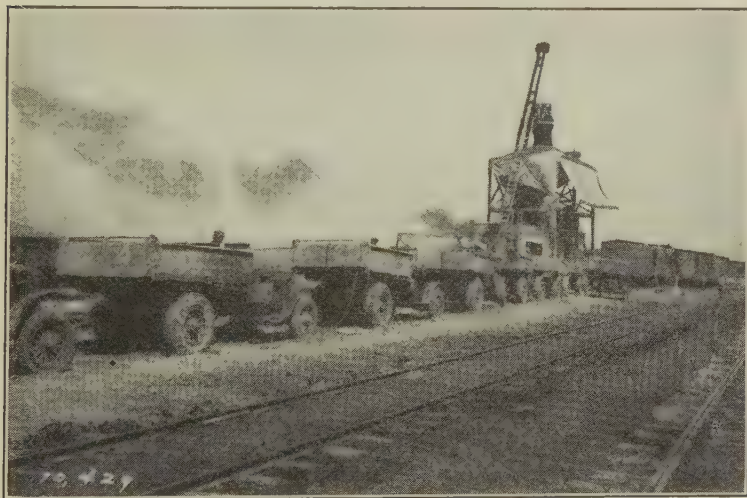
CENTRAL MIXING PLANT OF THE E. F. LYTLÉ CONSTRUCTION CO.,
